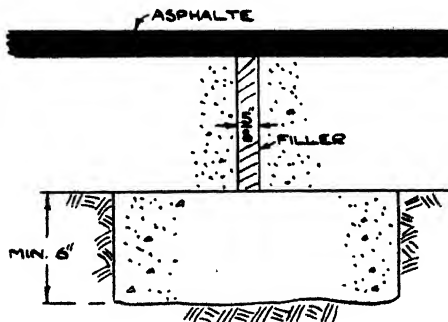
ASPHALTE COVERING TO EXPANSION JOINT IN A SINGLE-COURSE FLOOR FOR A TANK OR RESERVOIR
